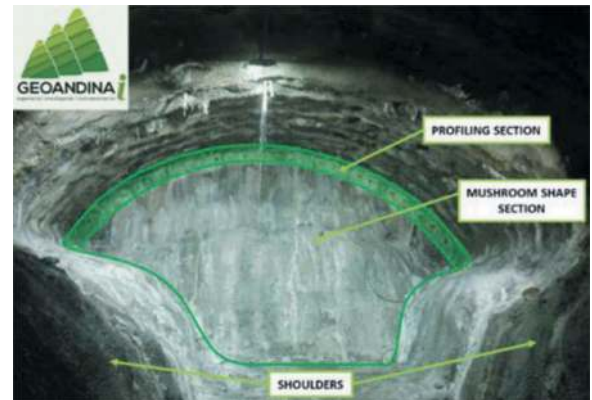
Tunnel excavation section in Patía geological fault - Tesalia tunnel.
